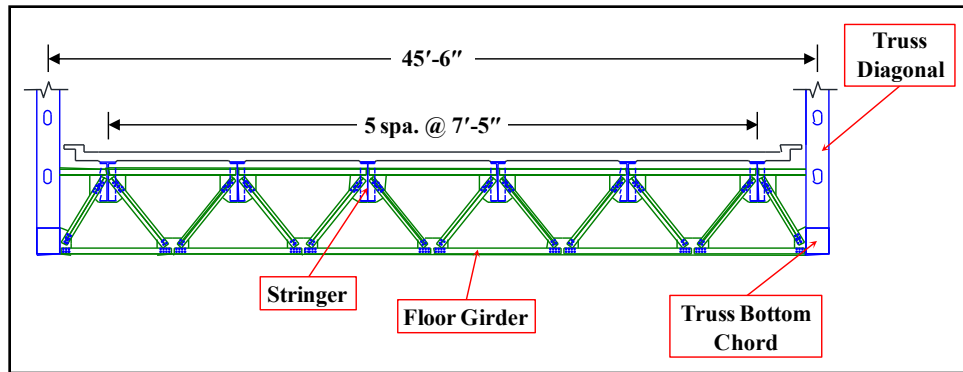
Typical deck cross section of the new truss bridge built in 1958
